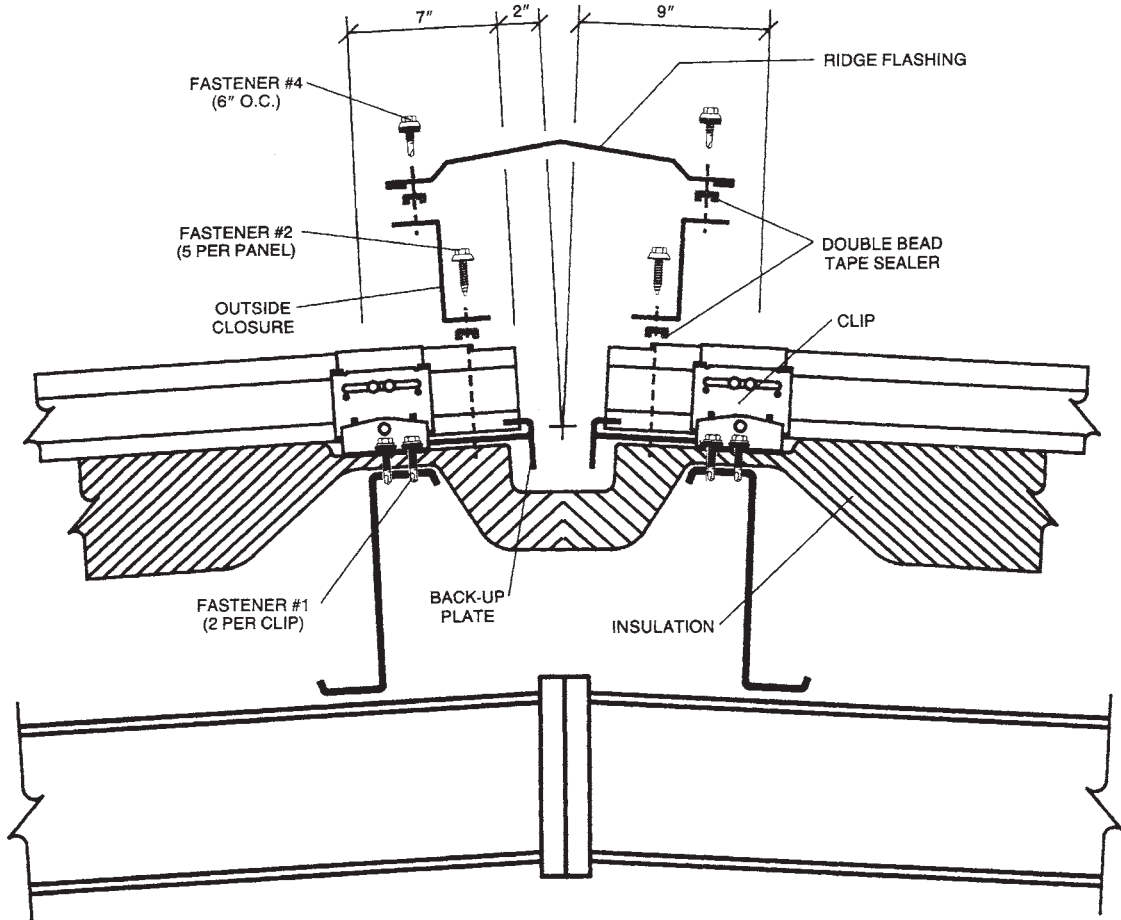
Floating ridge detail for standing-seam roof. (MBCI.)
